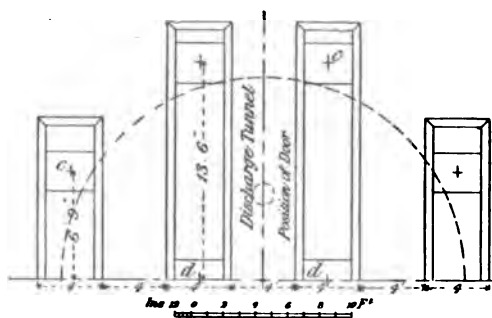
Pier for Double-tier Vats; Half Plan.
